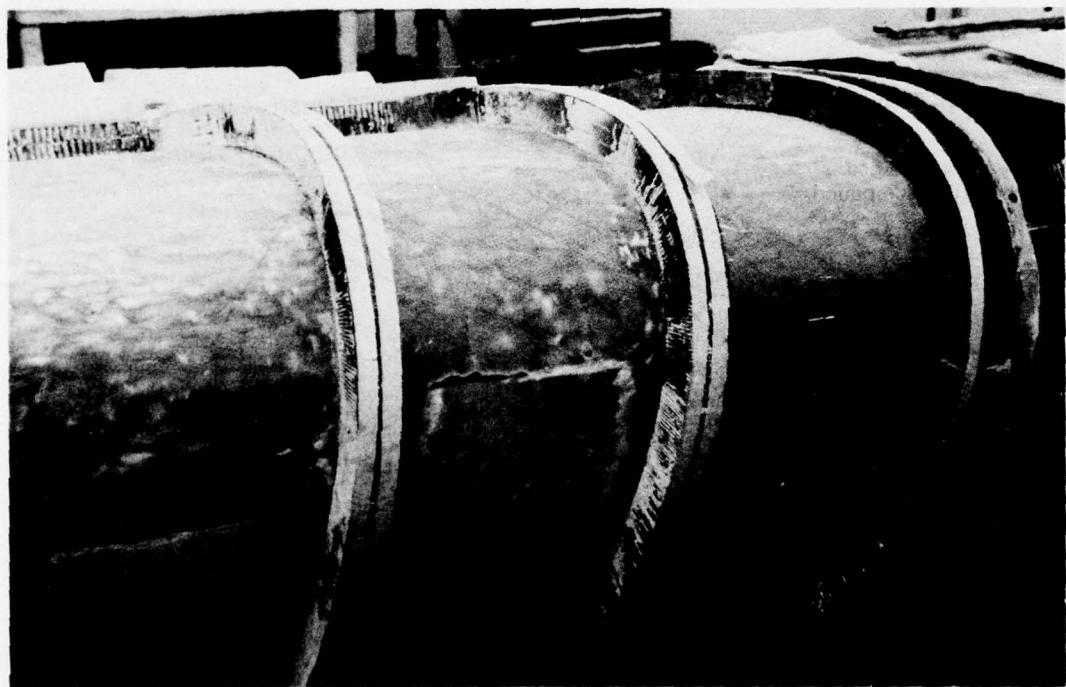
Core Removed With Bare Metal Areas to Demonstrate Surface Preparation Techniques
